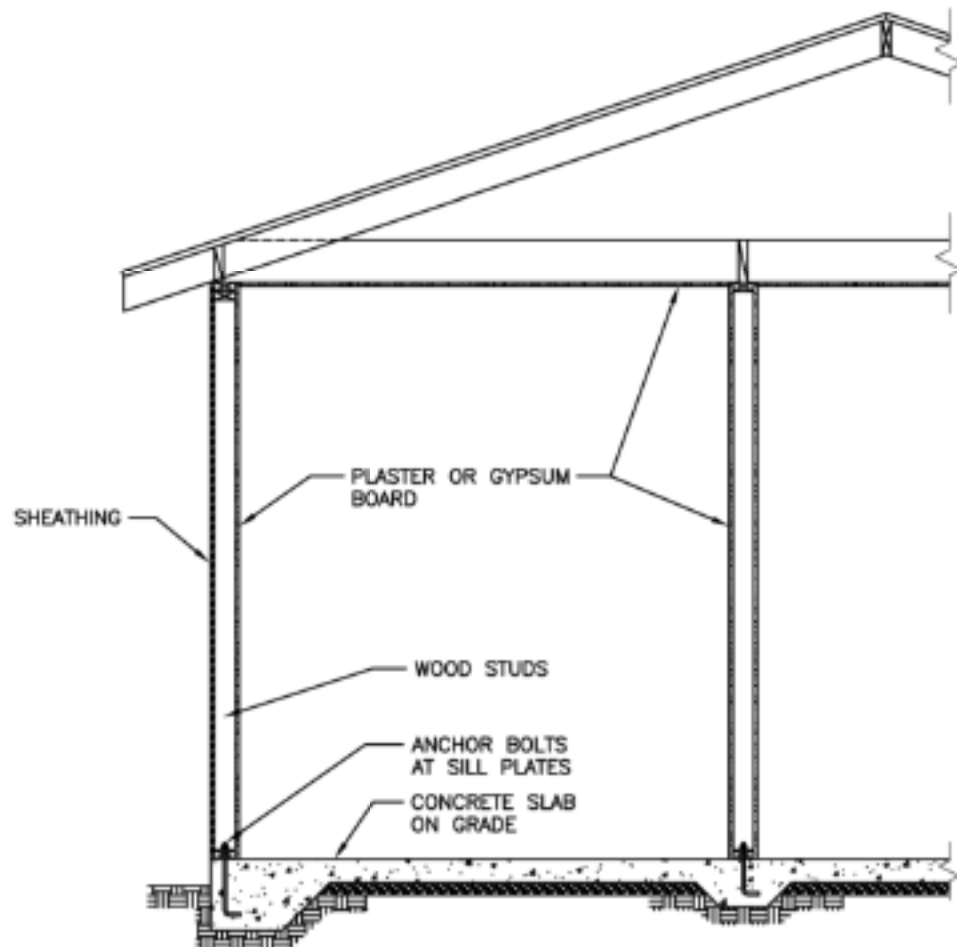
Section through typical one-story slab-on-grade house (from ATC, 2002).
